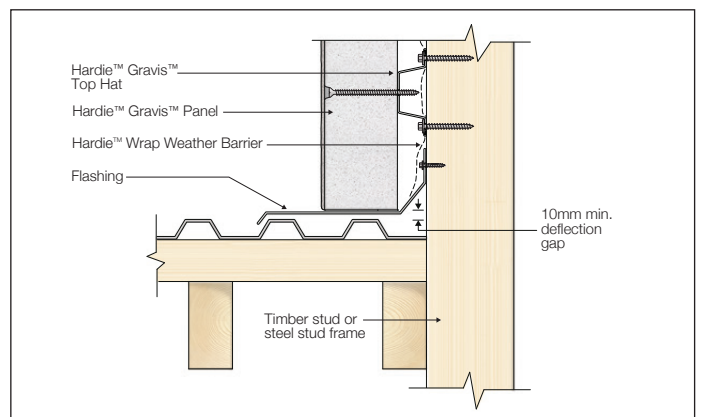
ROOF DETAIL WITH FLASHING UNDER PANEL
